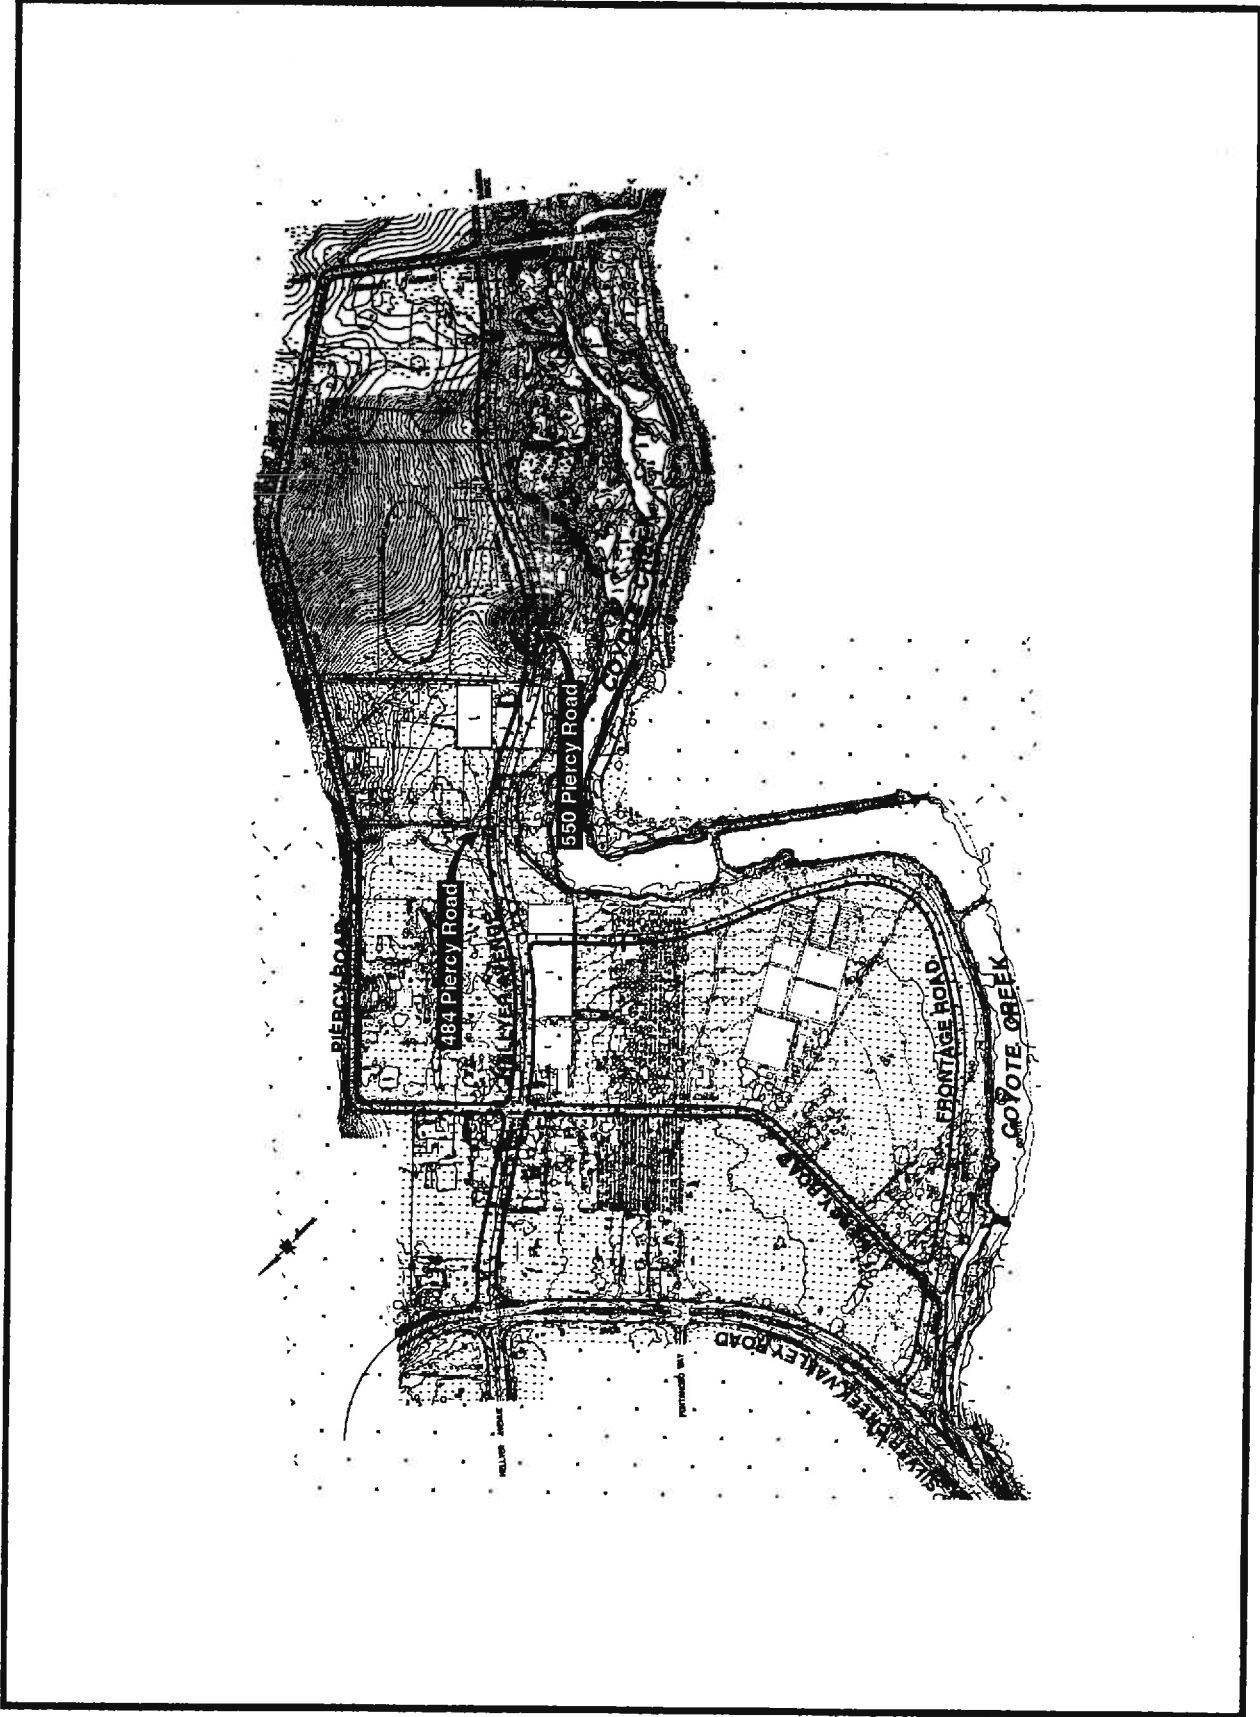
Proposed Hellyer Avenue Extension (San Jose Department of Public Works 1998:P-1)
